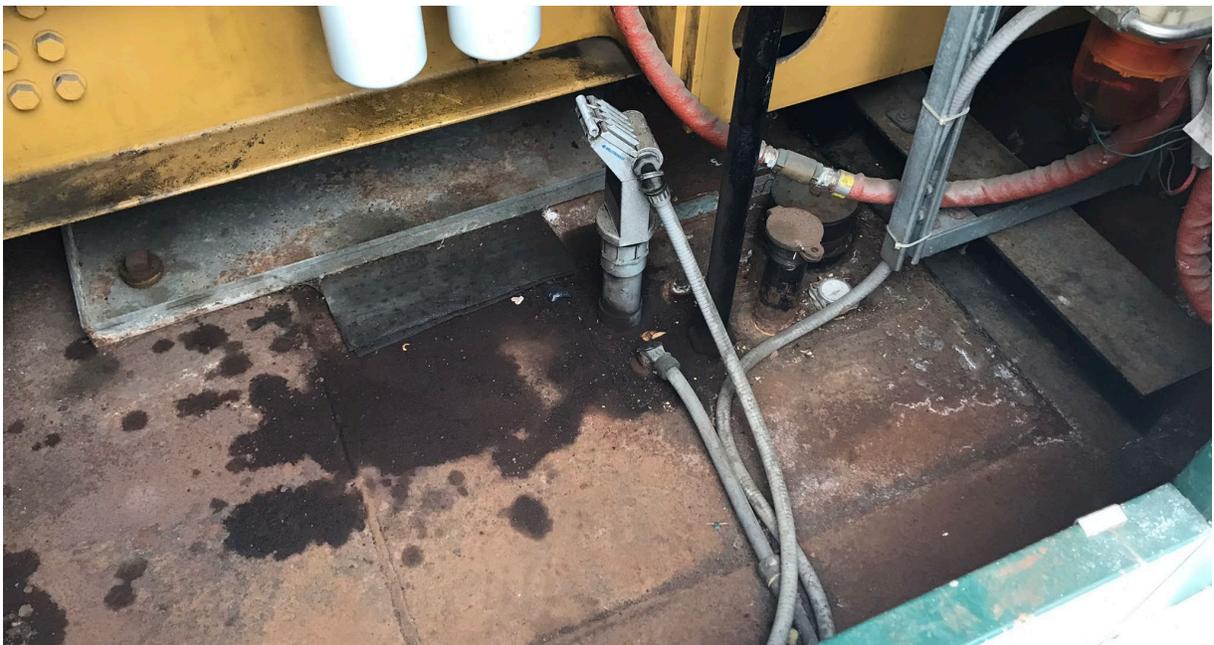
Evidence of drips/staining below generator (on top of decommissioned flat tank) in outbuilding located in the northeast portion of the Site.
